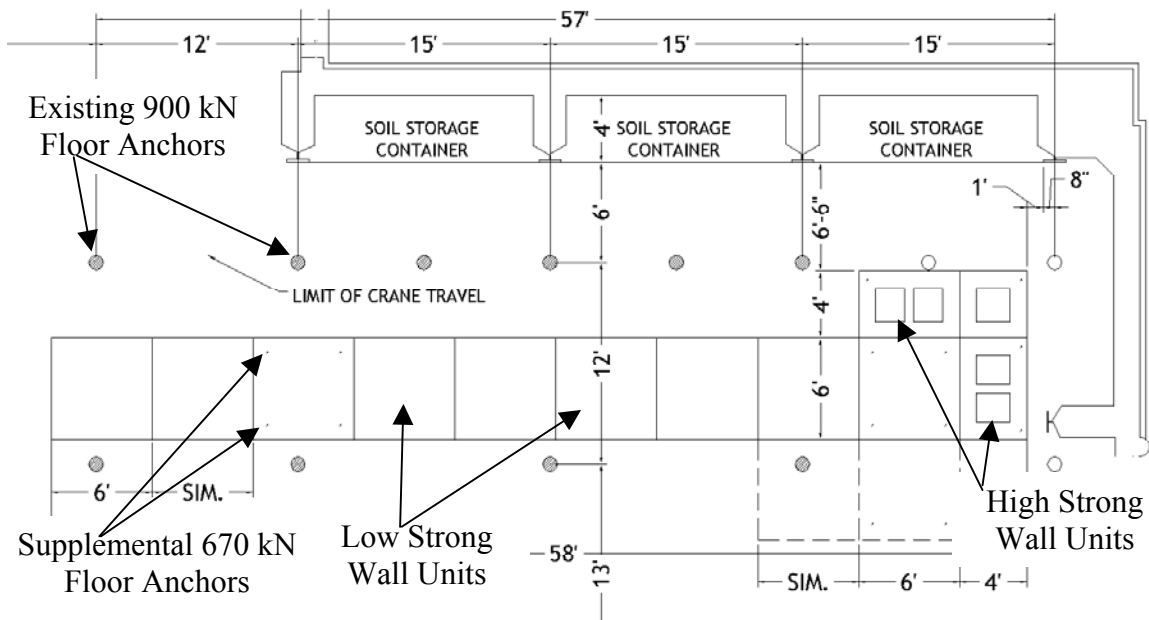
Plan View of Modular Strong Wall System for Large-displacement Lifeline Experiments
